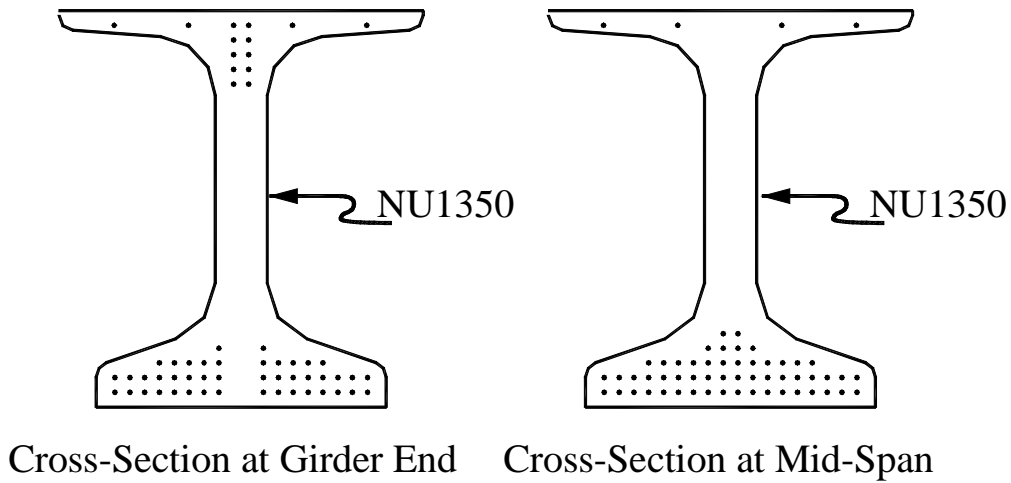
Project II Girder Pretensioned Strands Scheme
